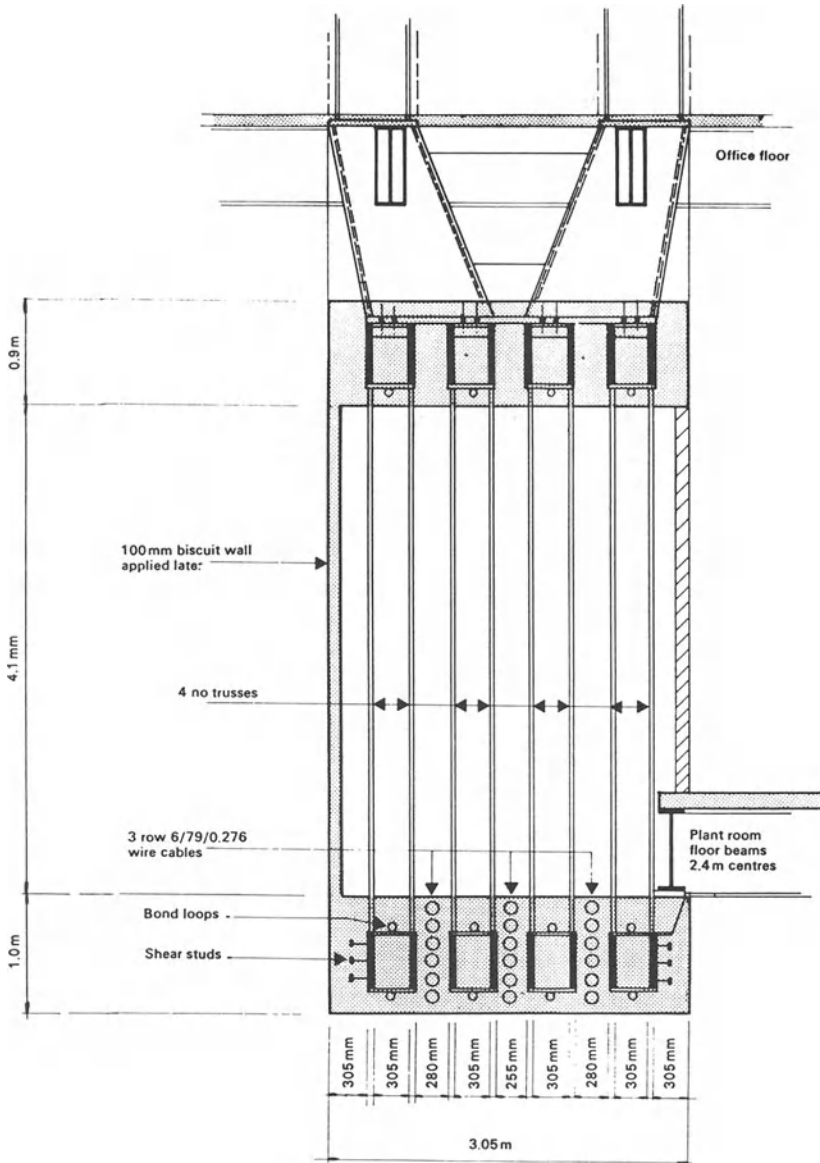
Cross-section through transfer girders, OCBC Bank, Singapore
